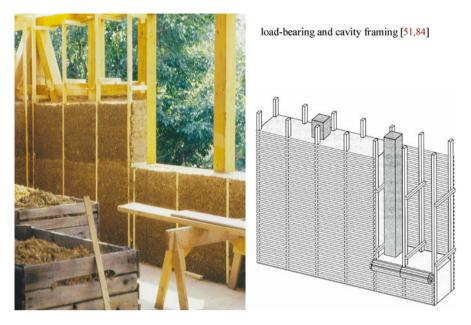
Timber-frame construction with light-clay infill, new residential construction
